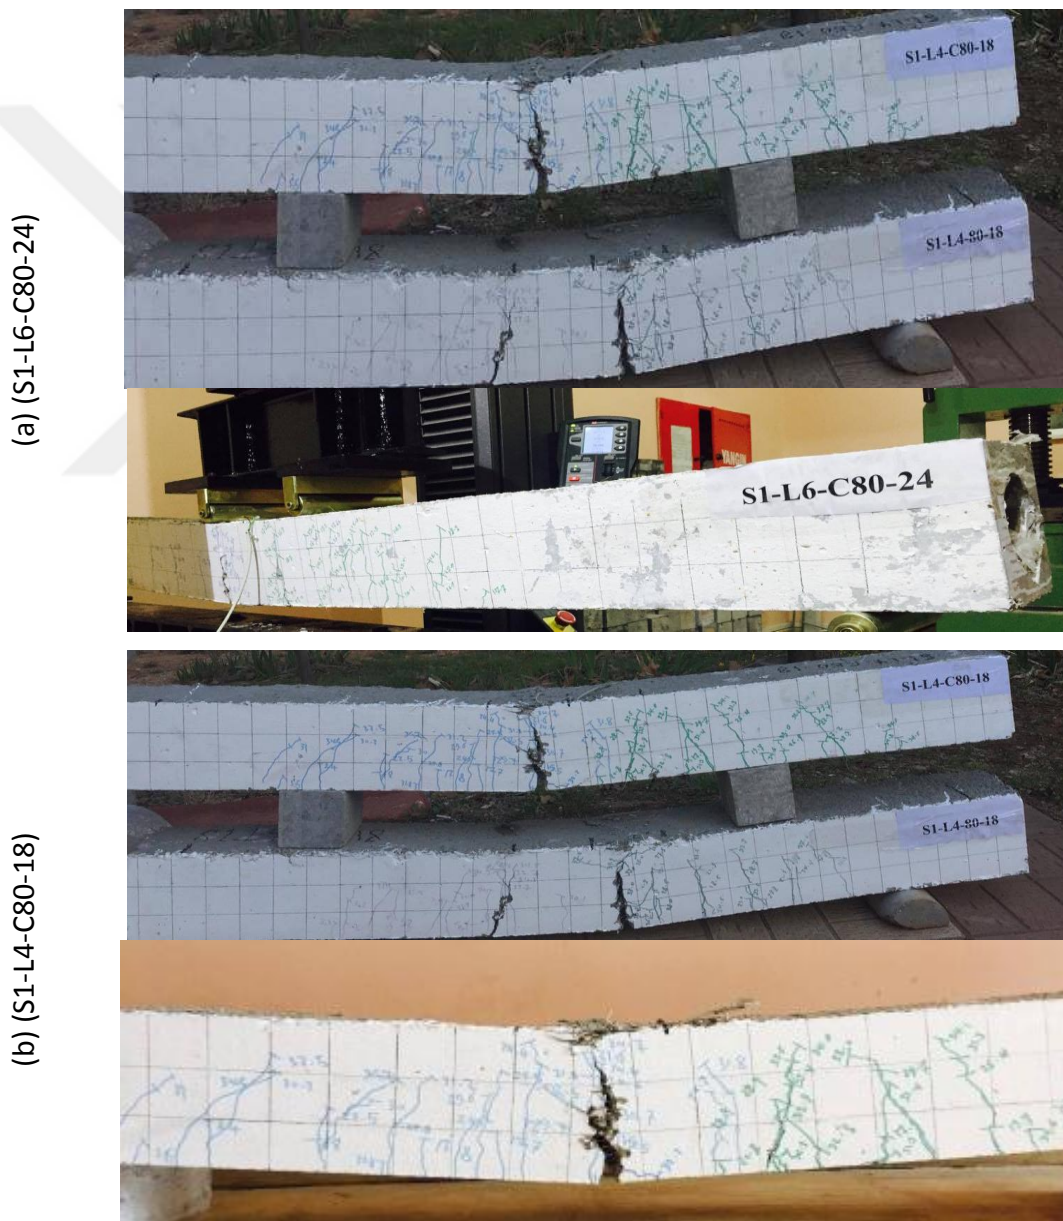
Crack pattern and structural failure for beam specimens of Group E.
